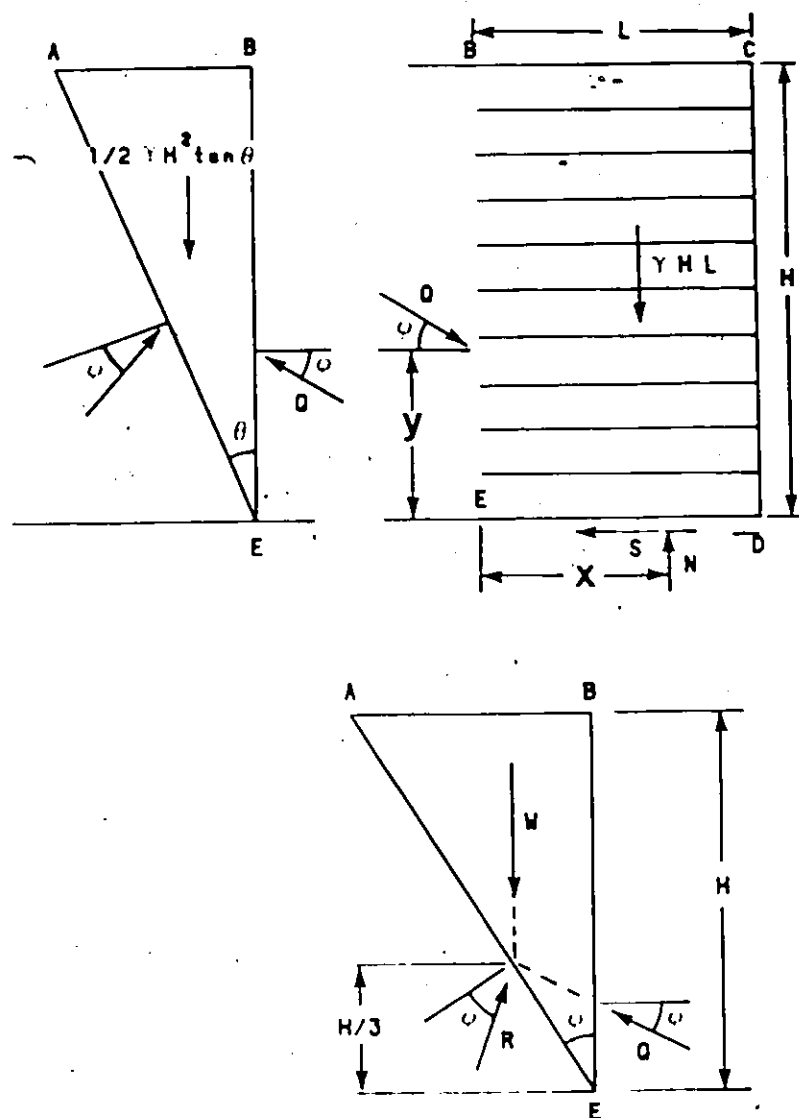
FORCES ACTING ON WEDGE AND REINFORCED ZONE AT FAILURE
